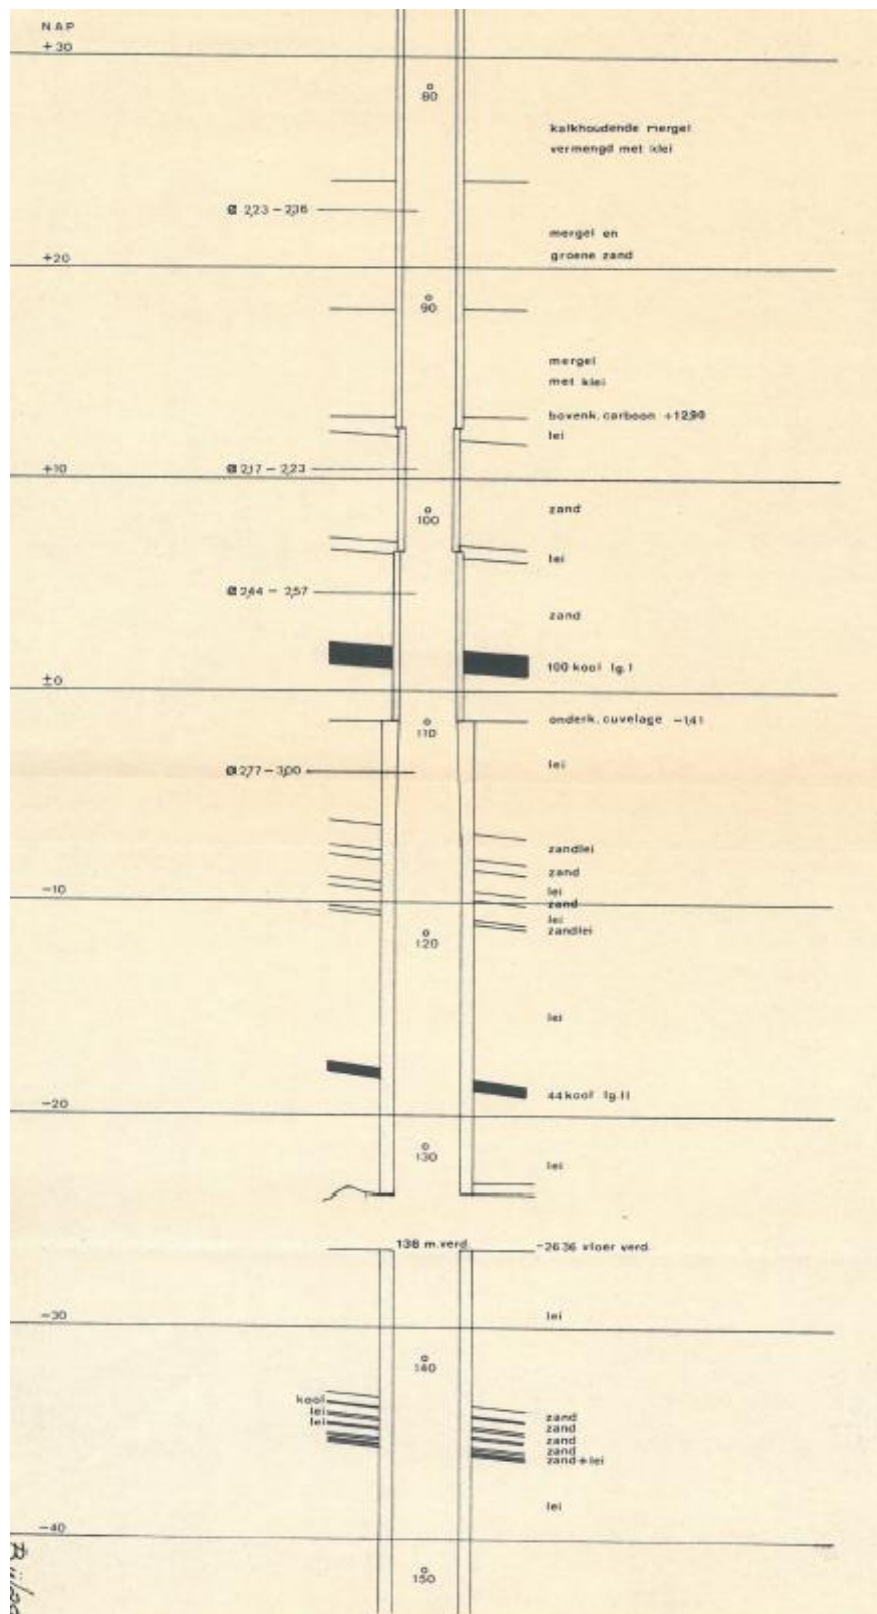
Strata shaft I, ON I, 136 m floor /36/
